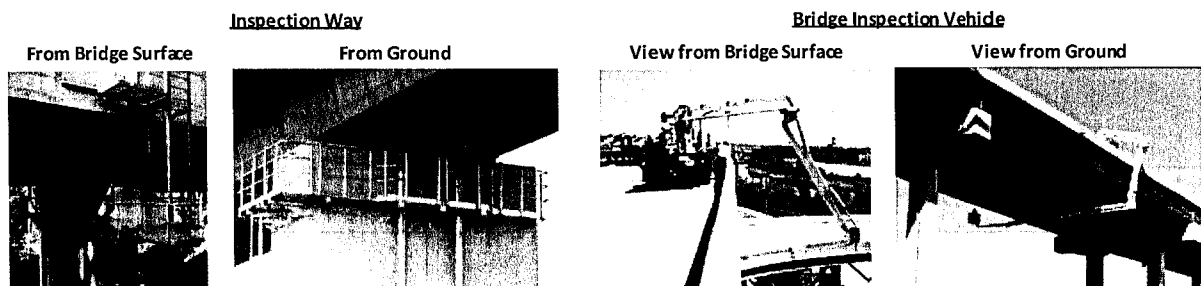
Images of Inspection Way and Bridge Inspection Vehicle
